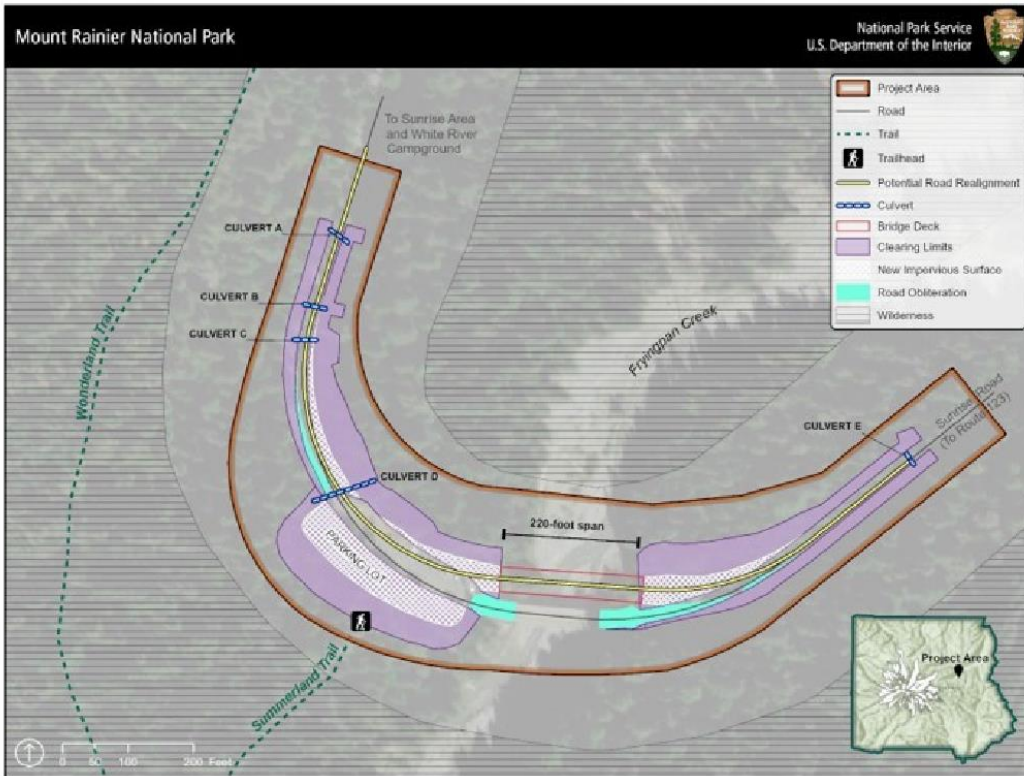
Fryingpan creek bridge proposed replacement bridge project area showing clearing limits in purple, culvert replacements, and proposed parking area.
